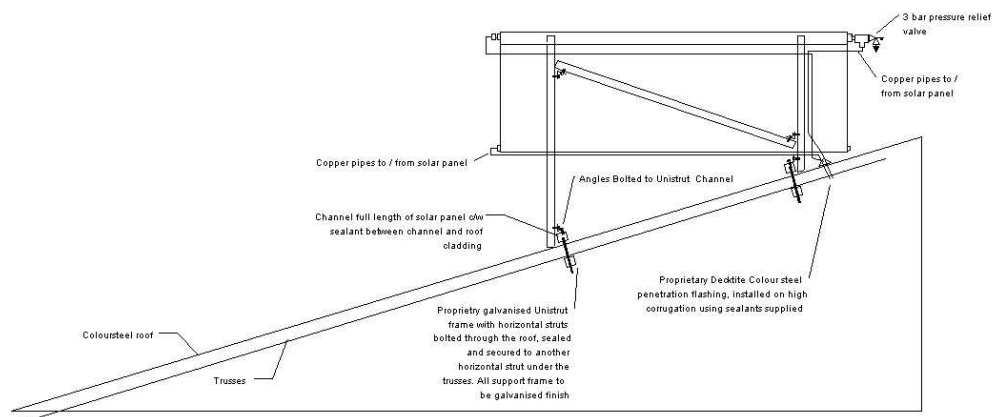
Fixing method pitching collector off of a flat, corrugated iron or shallow trough roof
